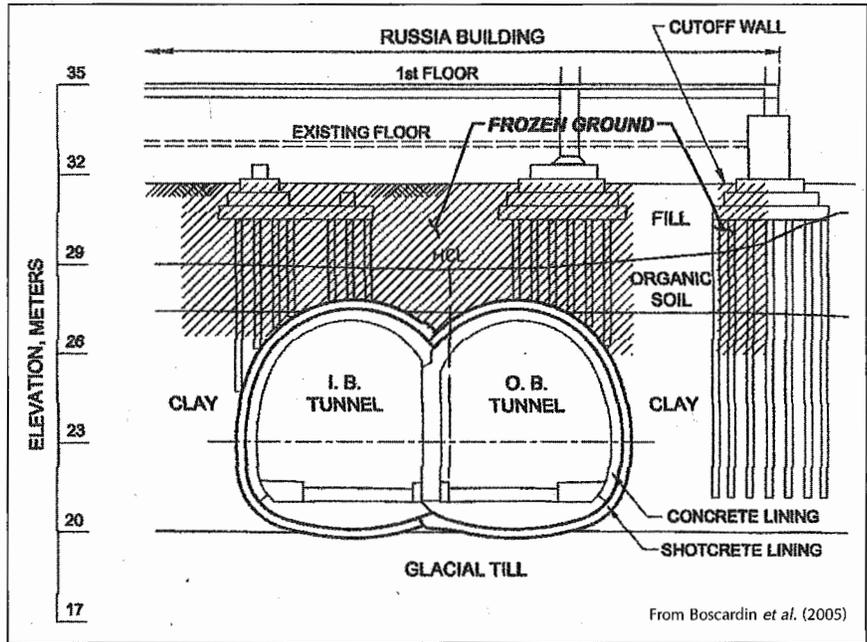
Section through the Silver Line tunnel beneath the Russia Wharf Building (view west).
